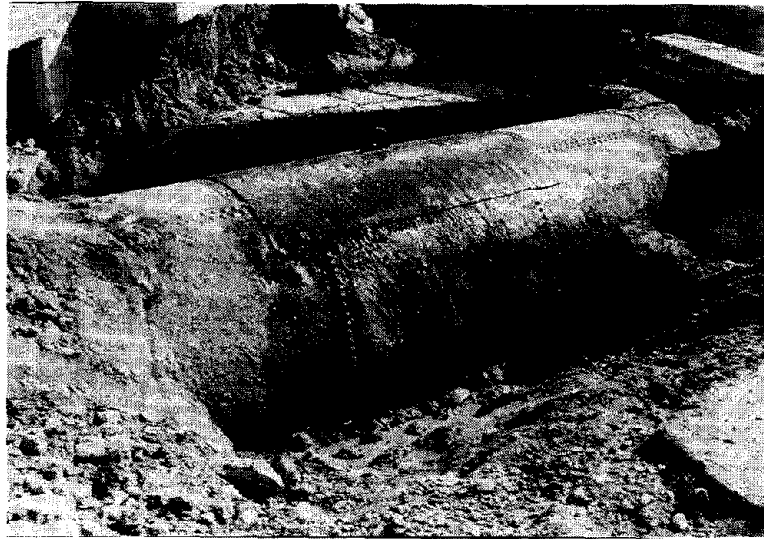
Rupture of a Main Water Pipe (Aqueducts Plant, DWP, City of Los Angeles)
